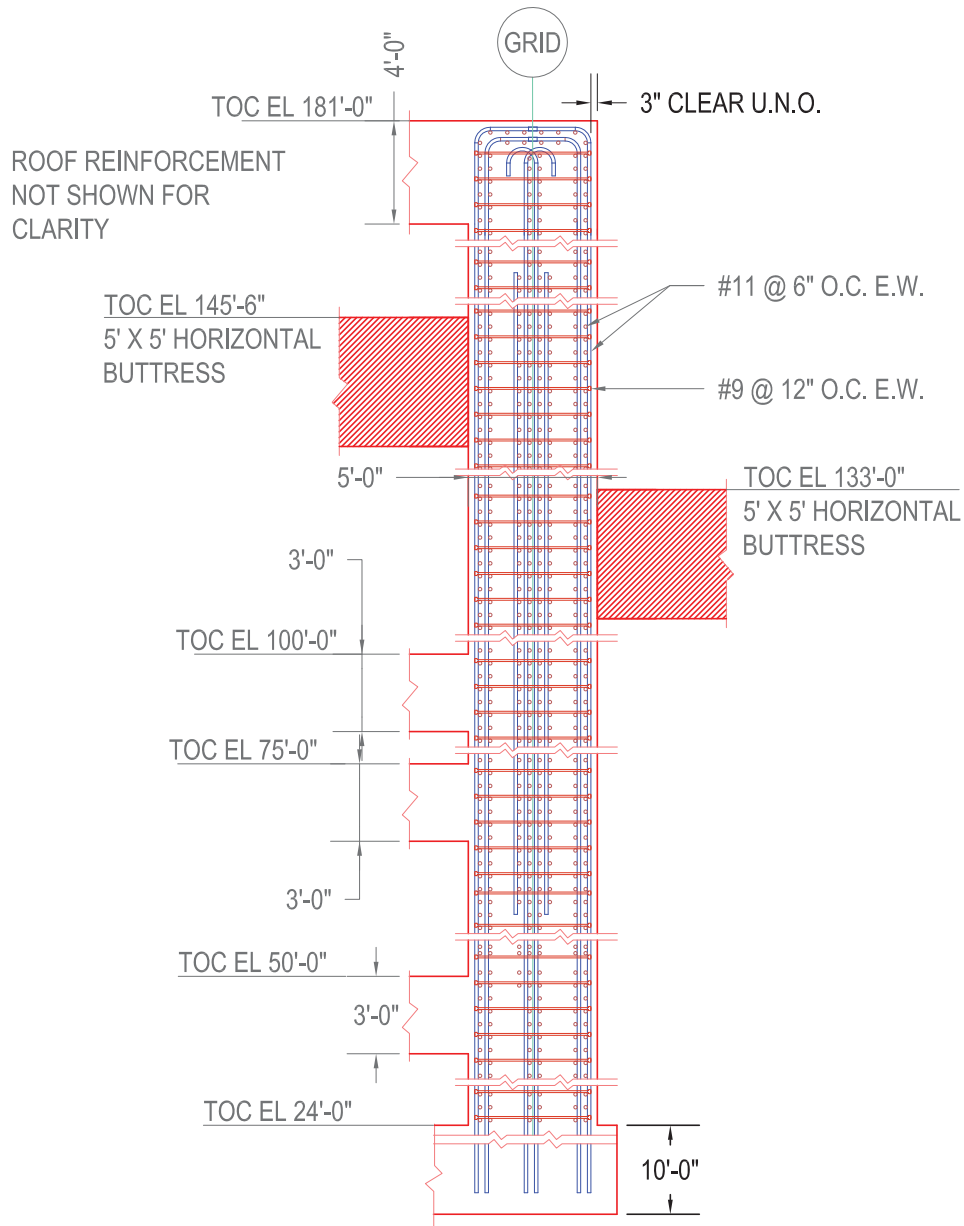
B-9: RXB Reinforcement Section View of Wall on Grid Line 1
